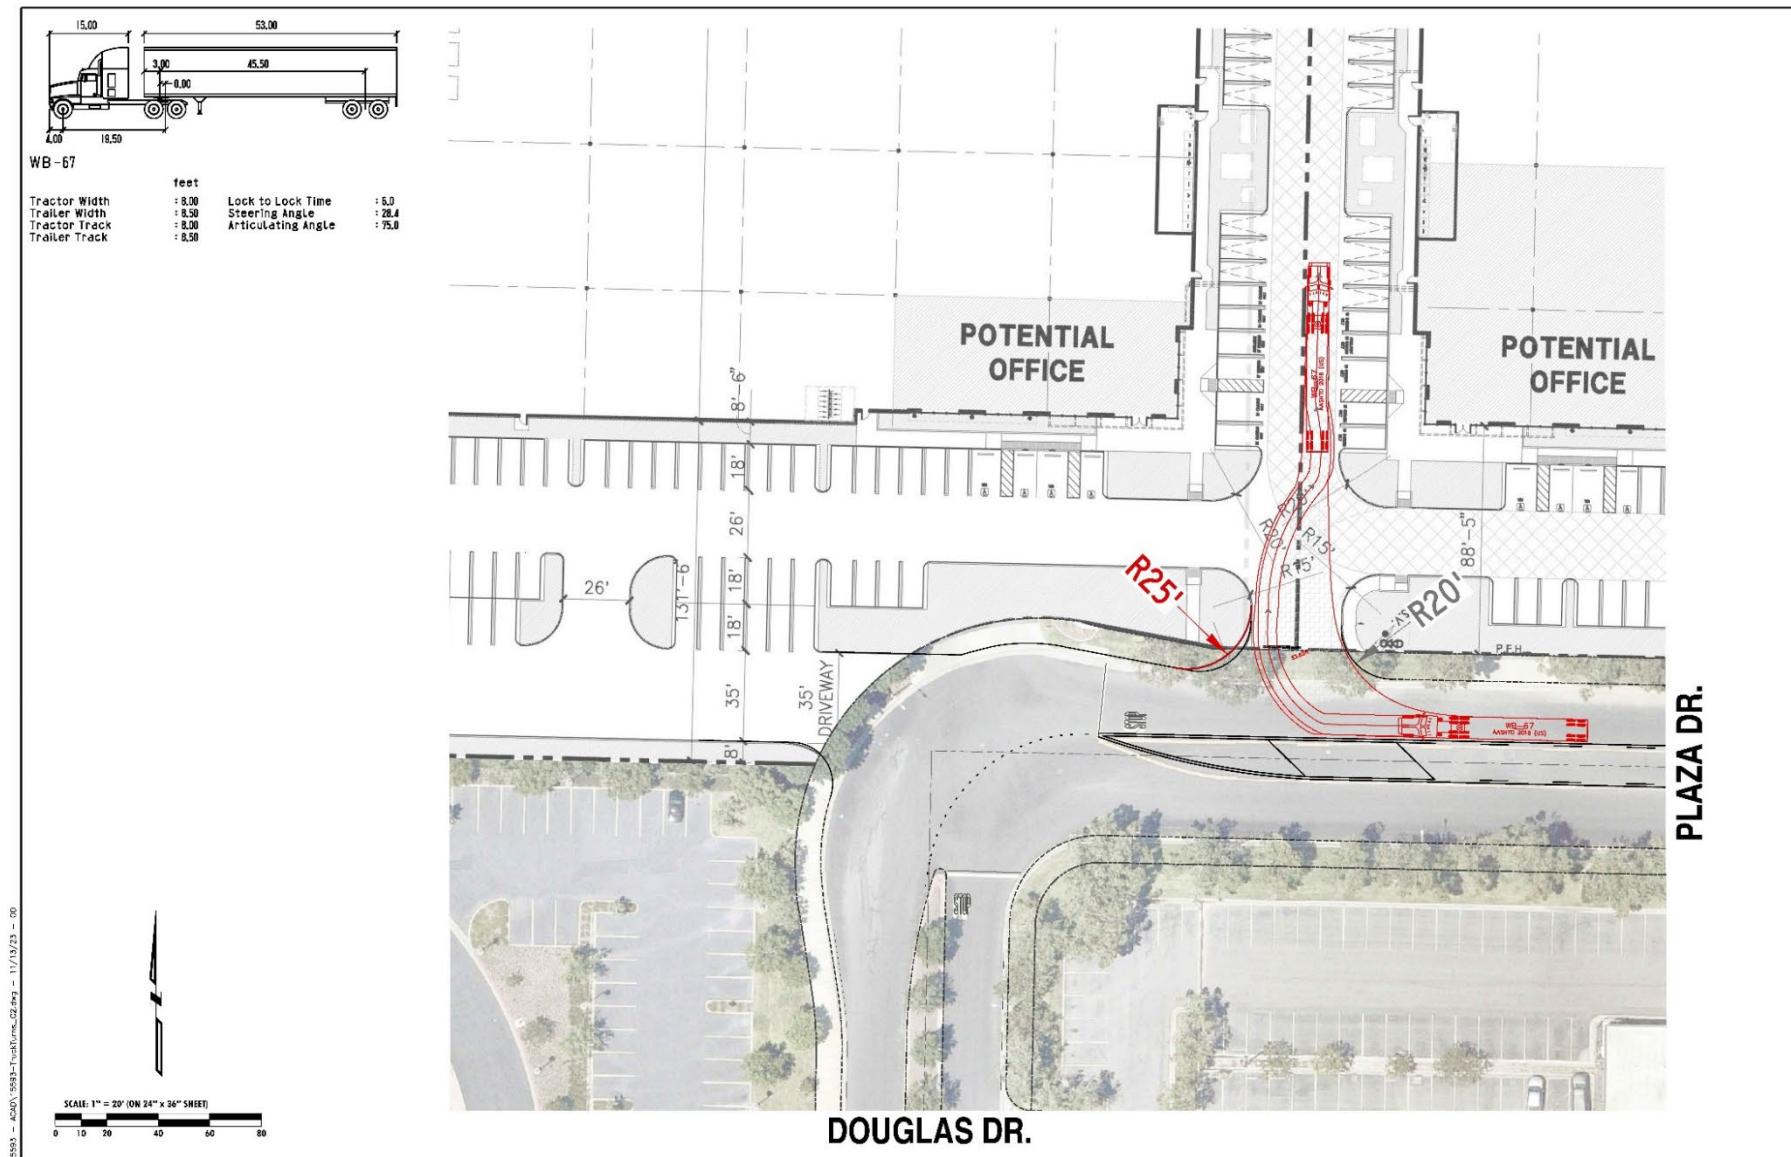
OUTBOUND TRUCK ACCESS AT DRIVEWAY 2
